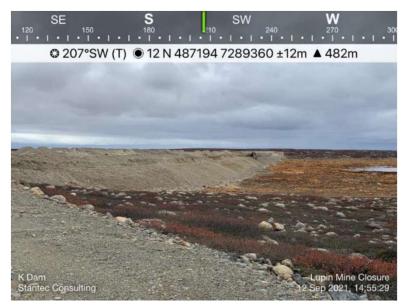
Looking southwest toward the south abutment of the reslope with compaction being carried out by the excavator.
